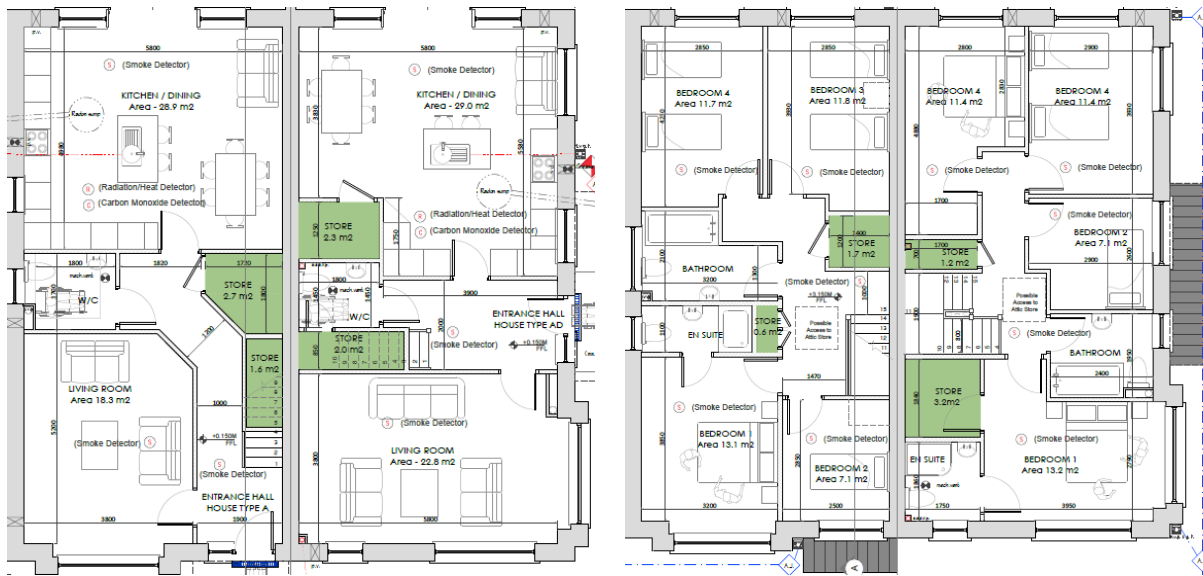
Typical ground floor plan of House Type A and House Type AD, respectively (left) and typical first floor plan of House Type A and House Type AD, respectively (right)
